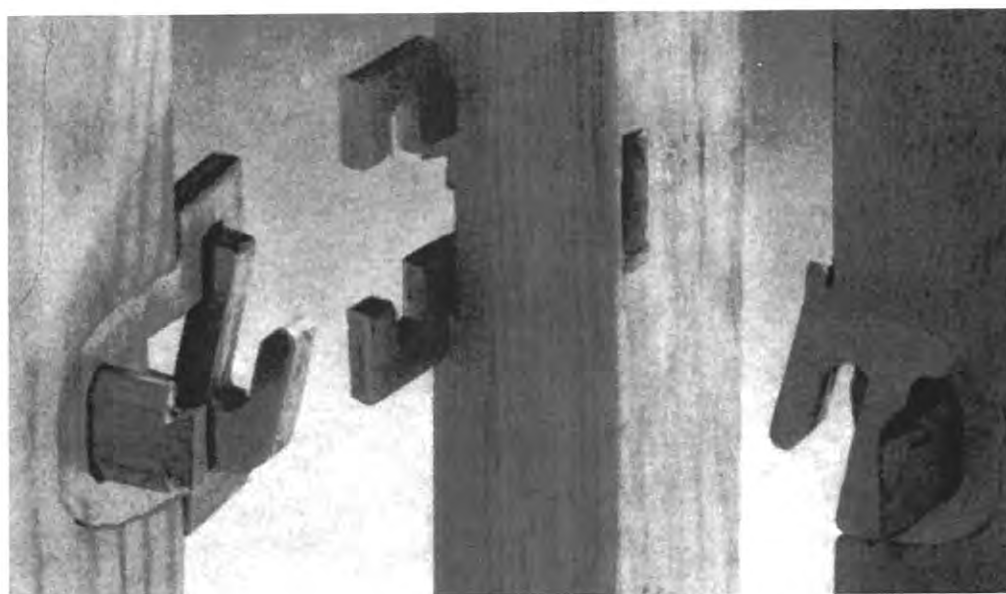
Packaged House System, 1942. Details. (© Sparks Co Inc NY / Wachsmann Wendepunkt im Bauen, Krausskopf, 1959)
